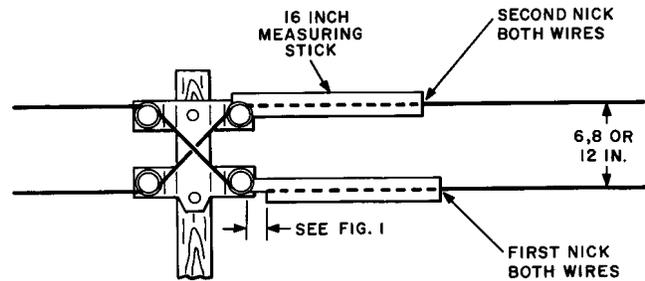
Measuring Stick Placed for Nicking Sleeves
